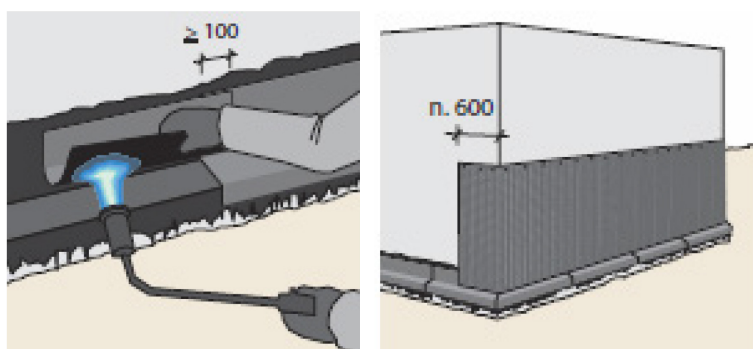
Bitumen-membrane insulation (left) and foundation-wall-sheet insulation (right). (RT 83-10955, 2009).
